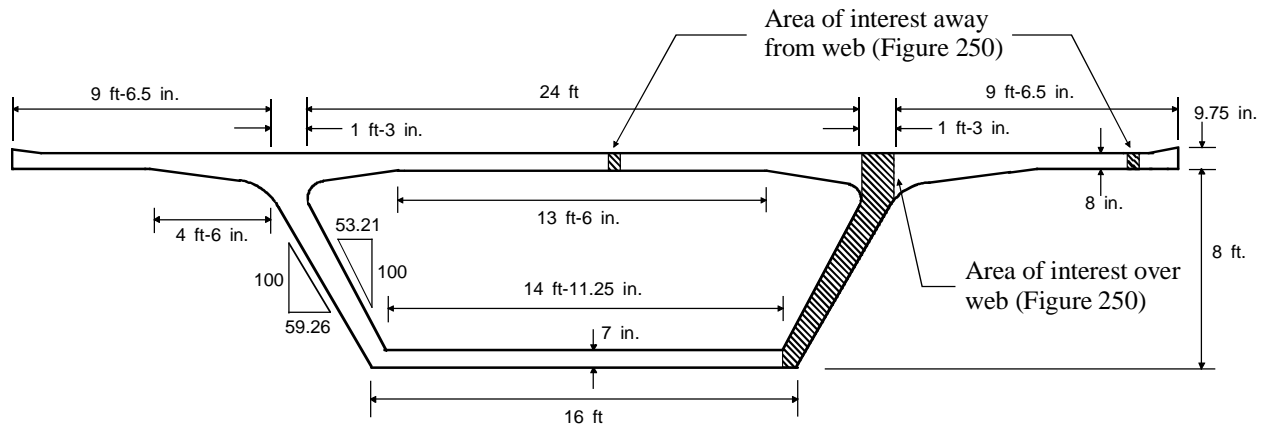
Typical cross section of Santa Rosa Bay Bridge
